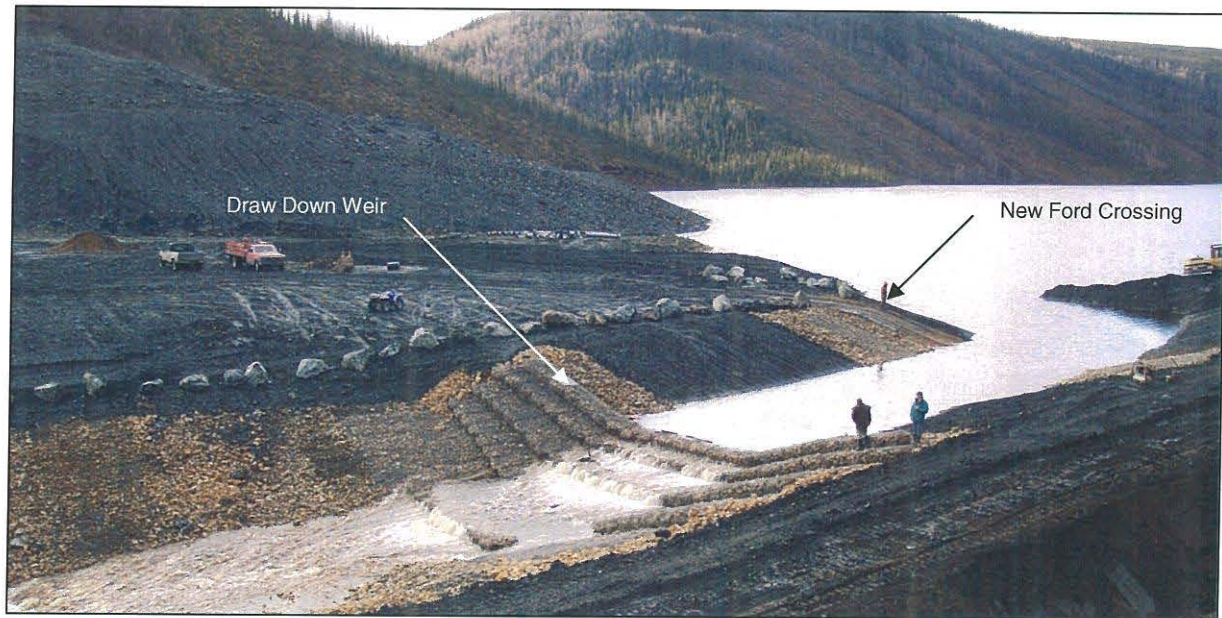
First Drop Structure at Hudgeon lake Outlet
